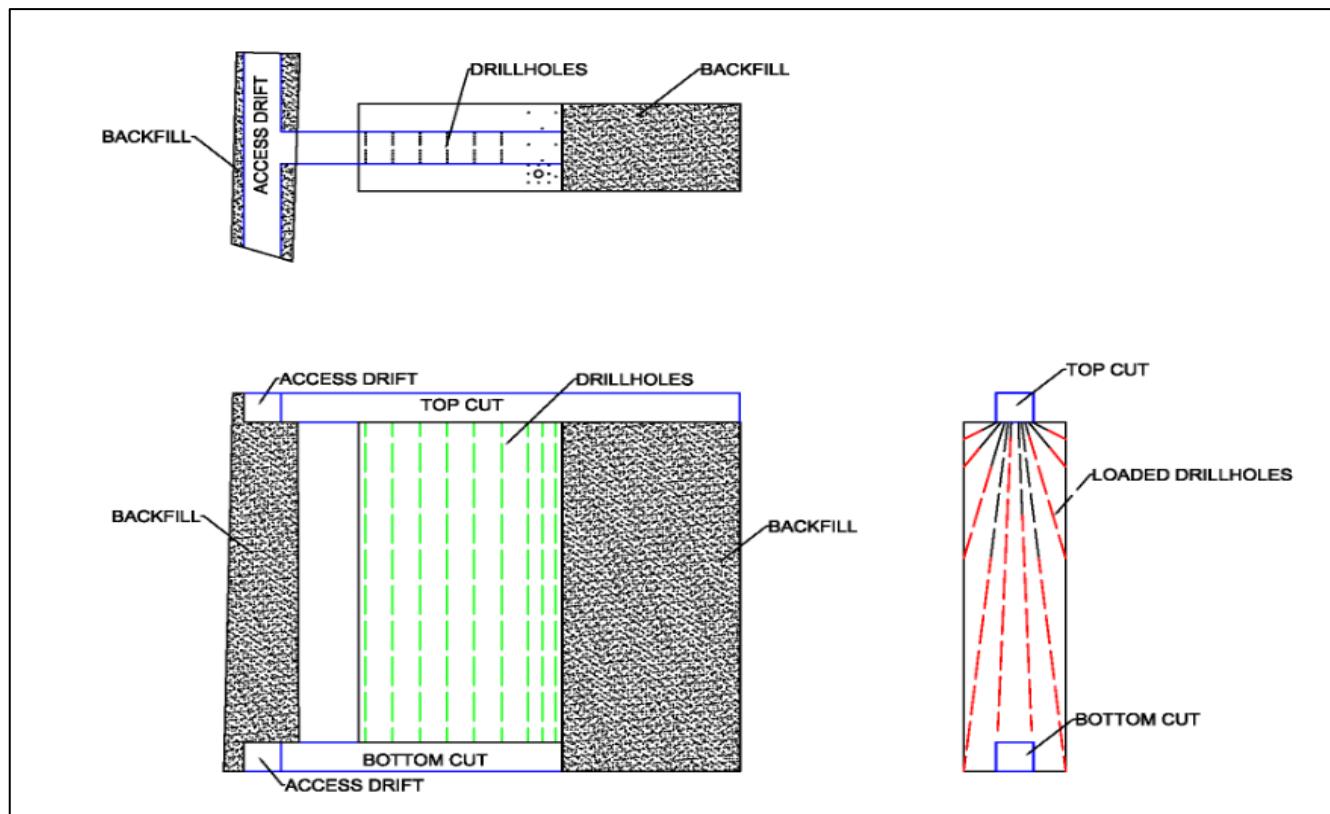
Proposed longhole open stoping method (longitudinal section view)
